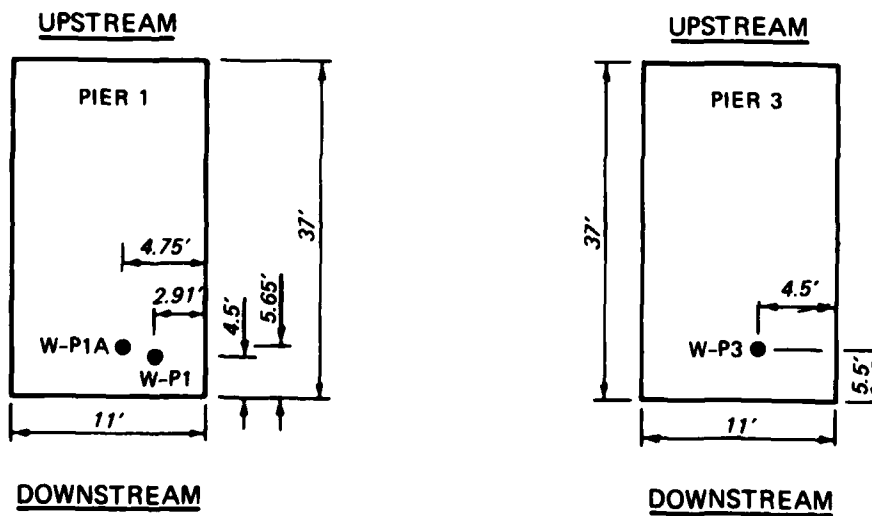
Schematic plan view presenting locations of core holes in piers 1 and 3
